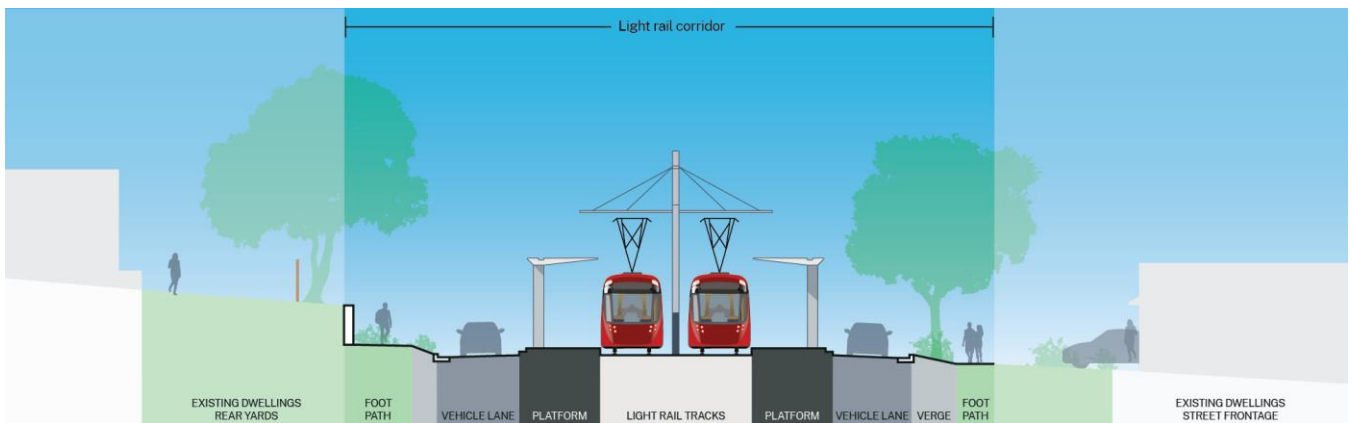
Indicative cross section of an on-road (segregated) arrangement with stop in the centre of the roadway
